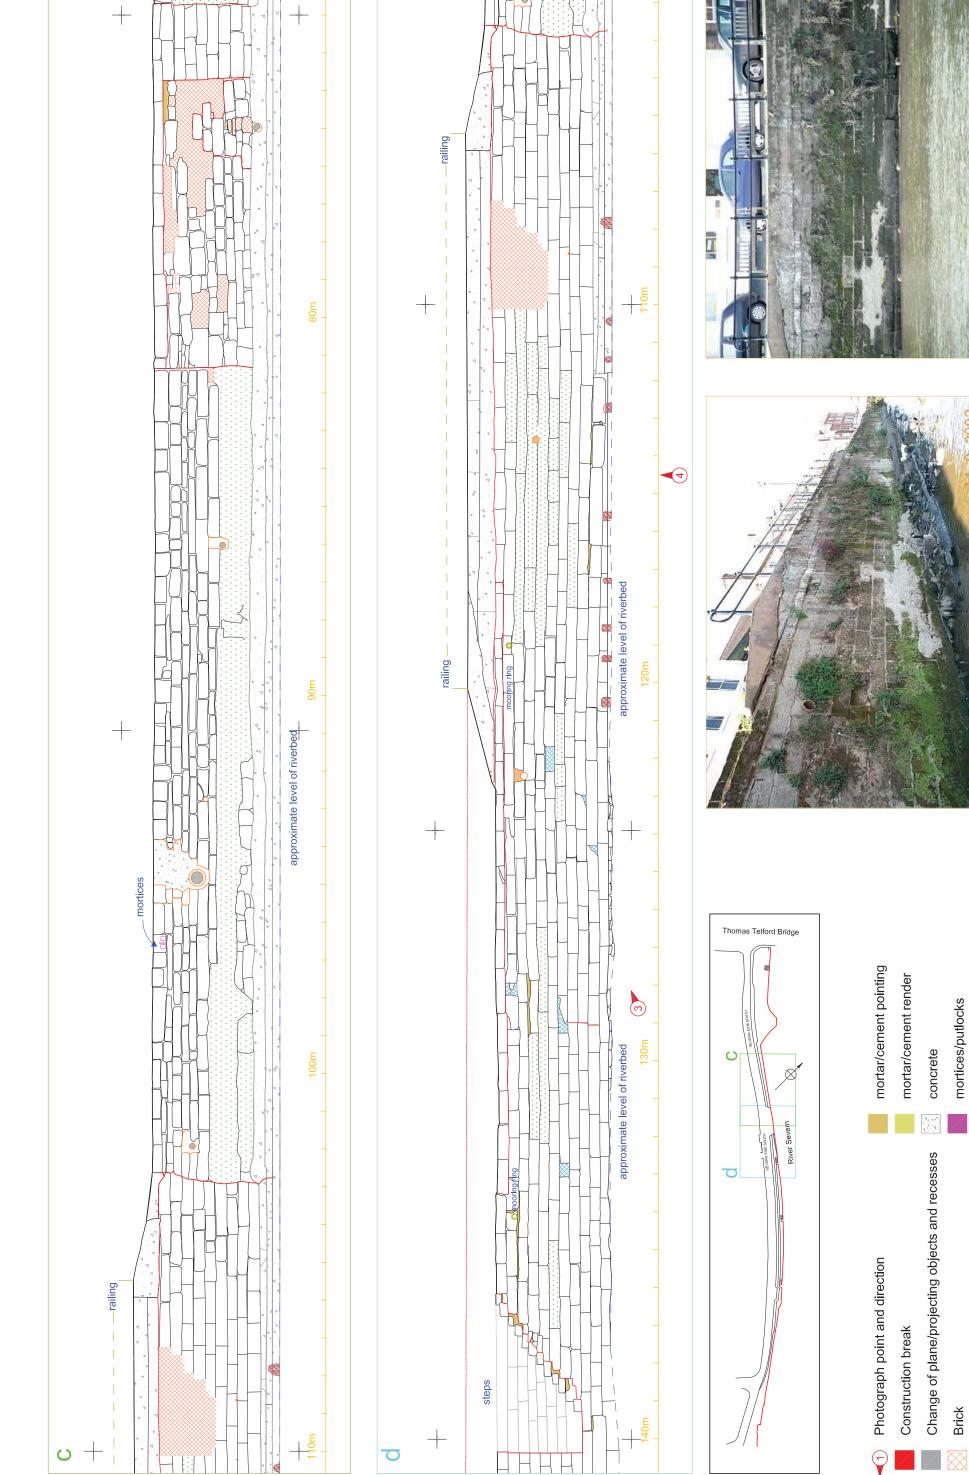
(ii): Elevation of quay wall - (divisions c and d)
